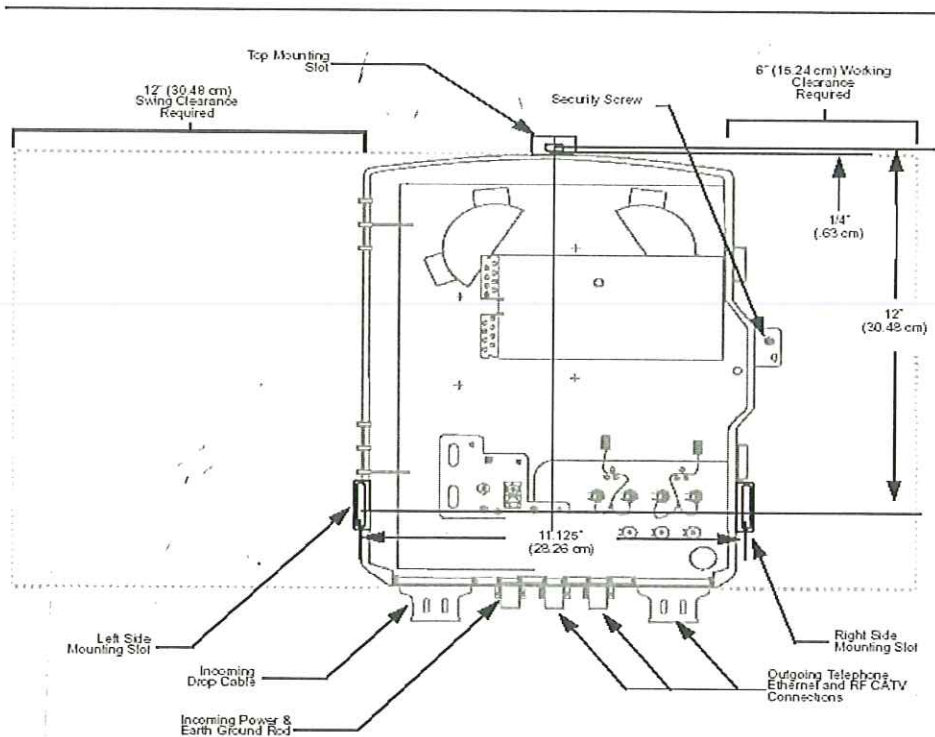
FiberPoint Mounting, Access Points and Clearances
